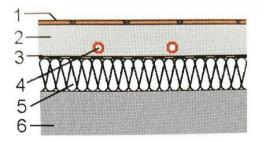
TYPE A system with pipes built into the plaster: 1= floor covering, 2= carrier and heat distribution layer, 3= protective layer, 4= heating cooling pipes, 5= insulating layer, 6= floor construction (2, 3)
